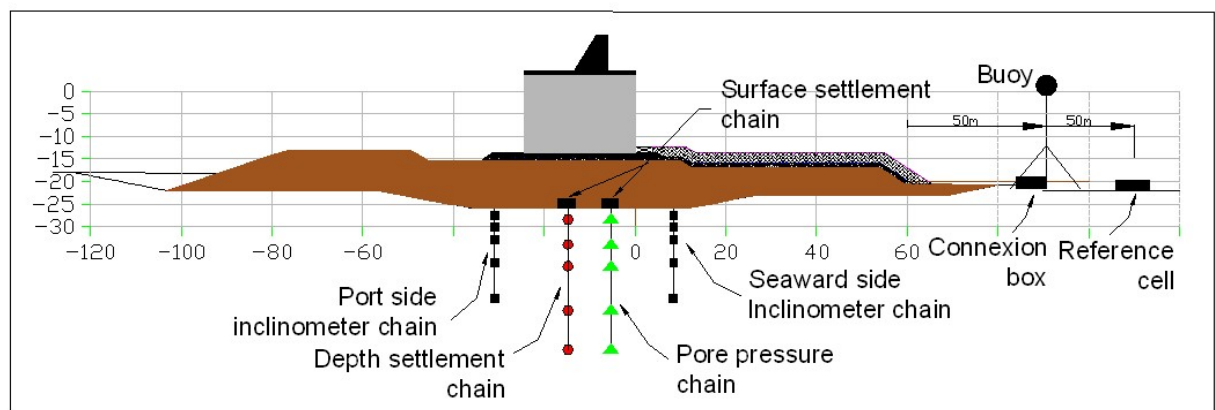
Typical cross section for vertical breakwater instrumentation.
